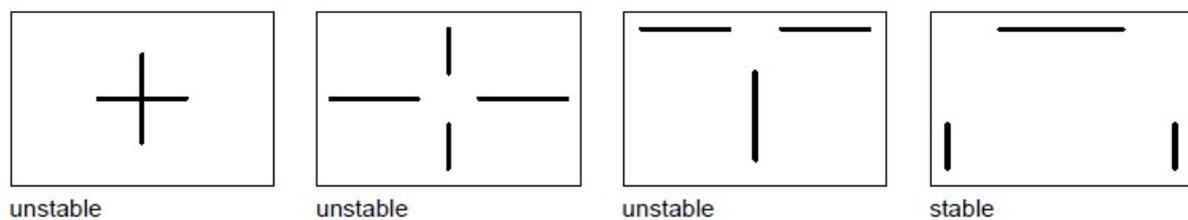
Positioning of bracing elements in the floor plan<sup>17</sup>
